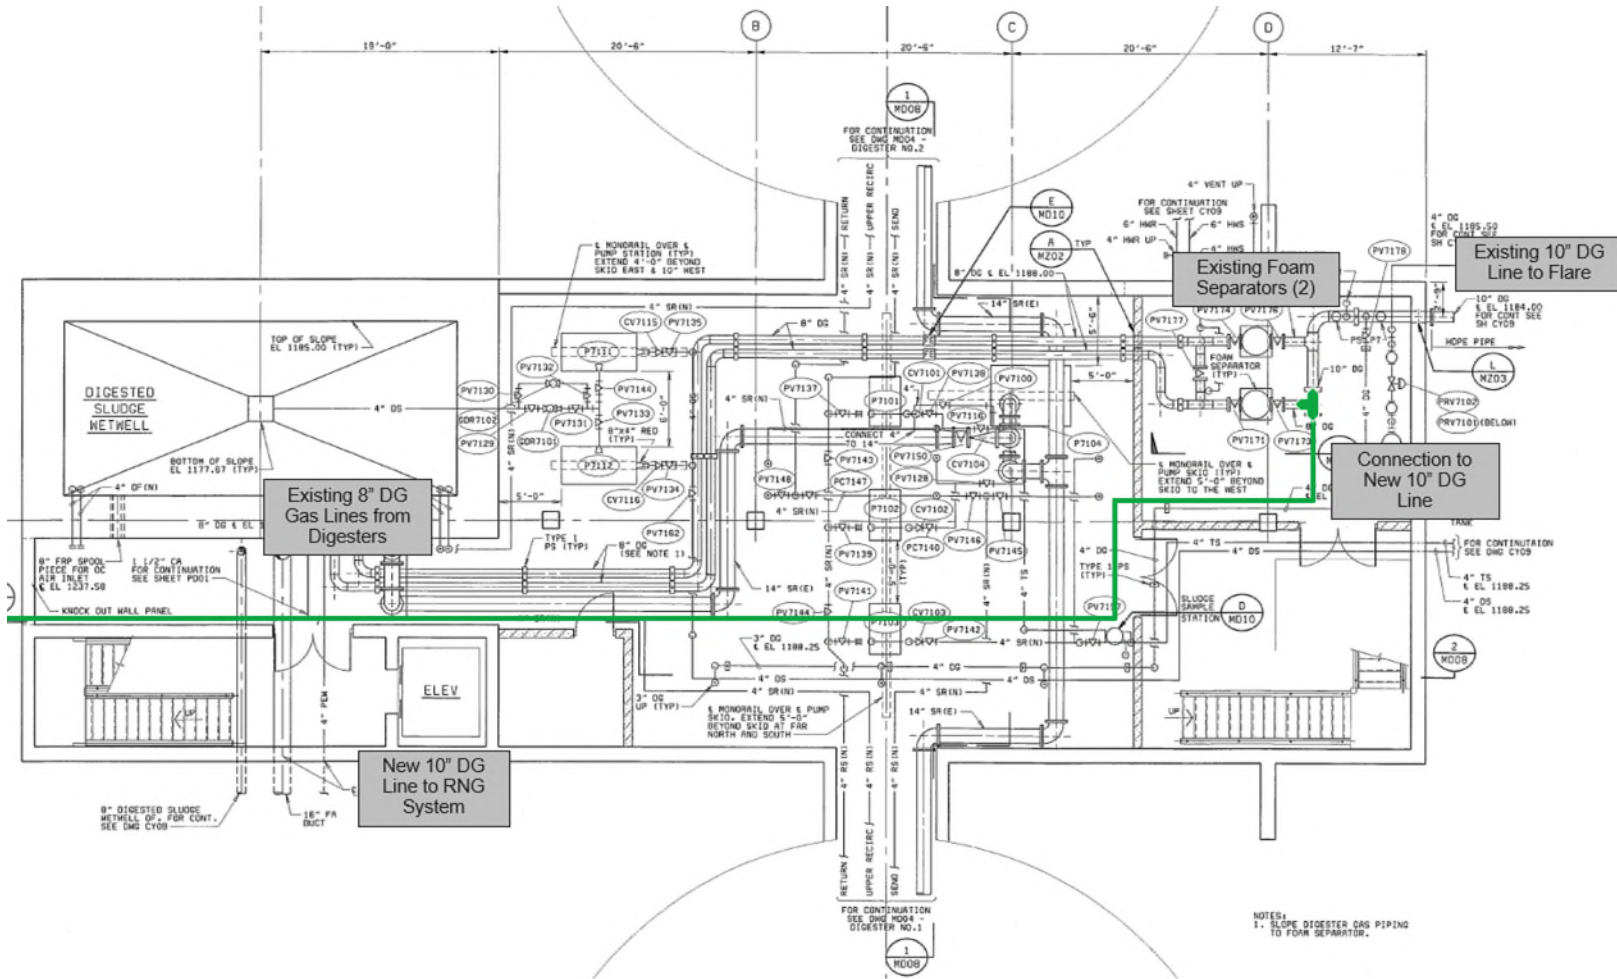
Proposed Biogas System in Digester Gas Building Layout
